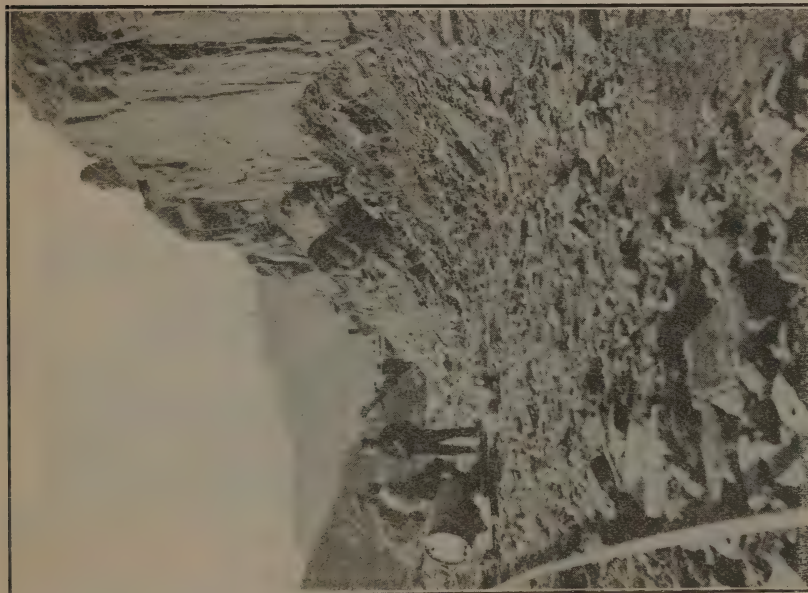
Plate V. State Highway, Mariposa County, between Mariposa and Briceburg, graded roadway under construction.
